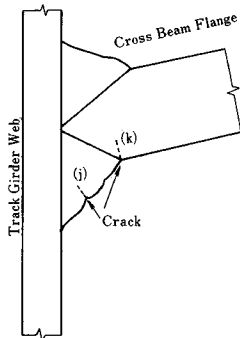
Fatigue Cracks in Weldment to connect Track Girder Web to Top Flange of Cross Beam.
